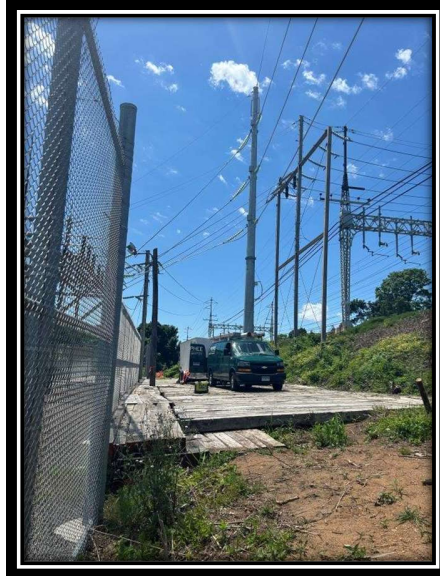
Matting adjacent to Elmwest Substation, facing west.
